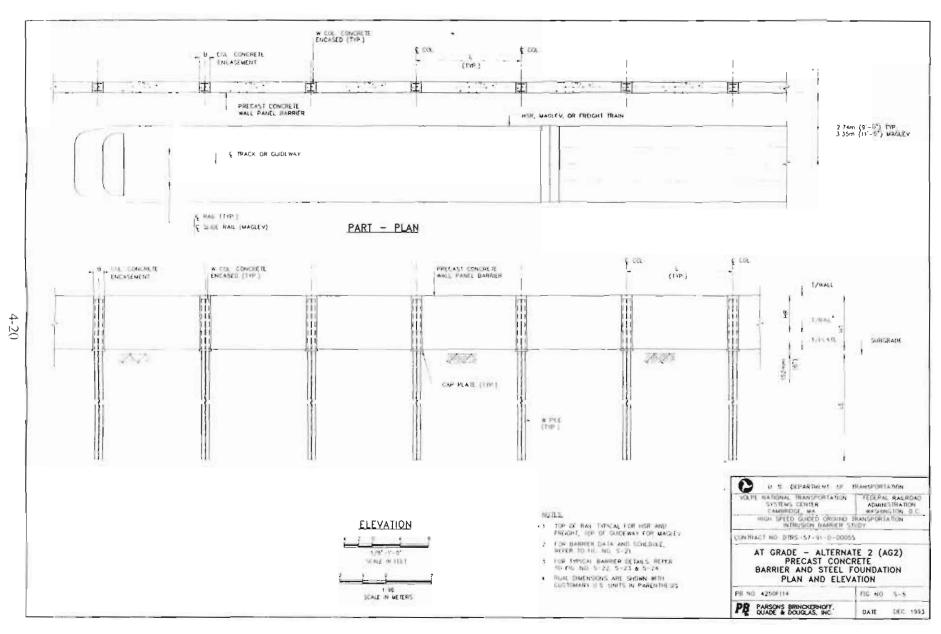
AT GRADE ALTERNATE 2: P/C WALL AND STEEL FOUNDATION - PLAN AND ELEVATION
